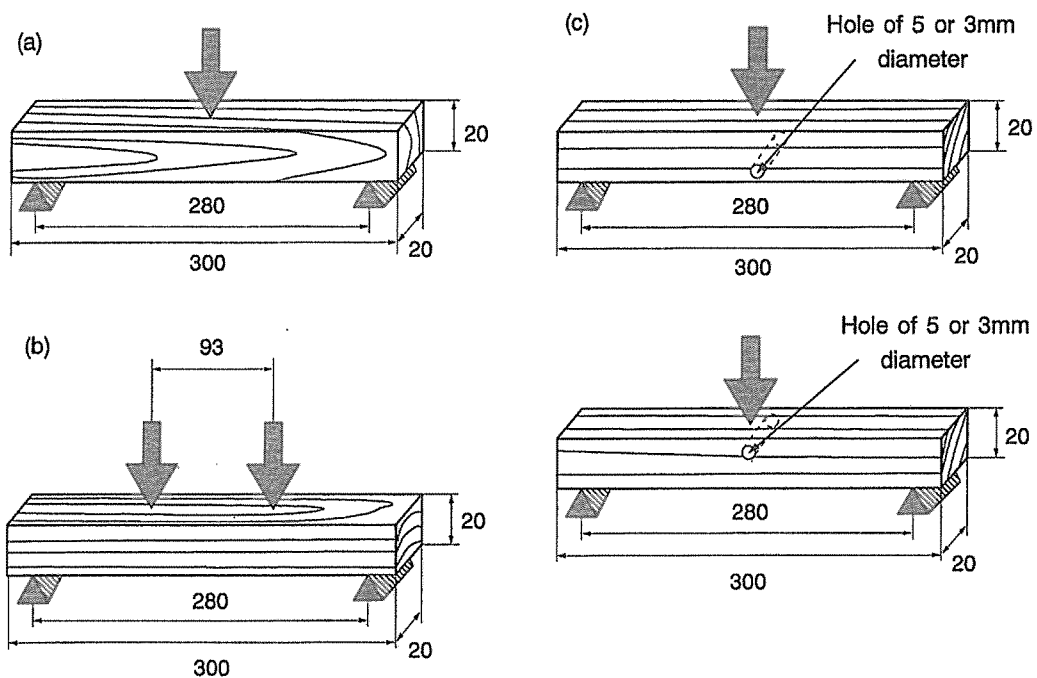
Specimen sizes and conditions for (a) center loading and (b) two-point loading tests of clear specimens, and (c) center loading tests of specimens with holes.
